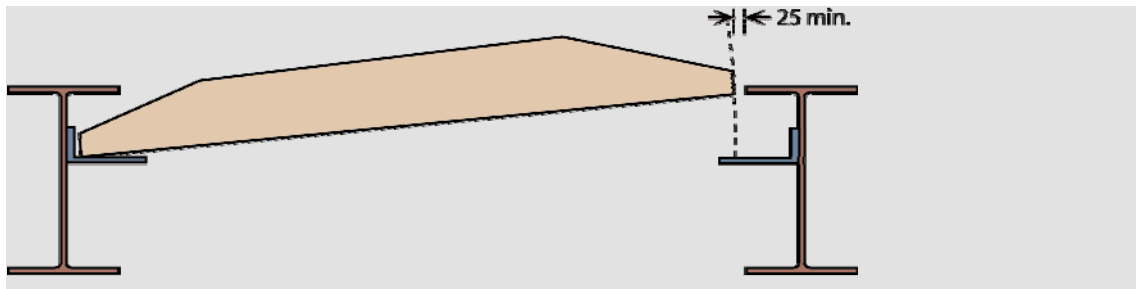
Bearing and clearance requirements for precast units on shelf angle beams
